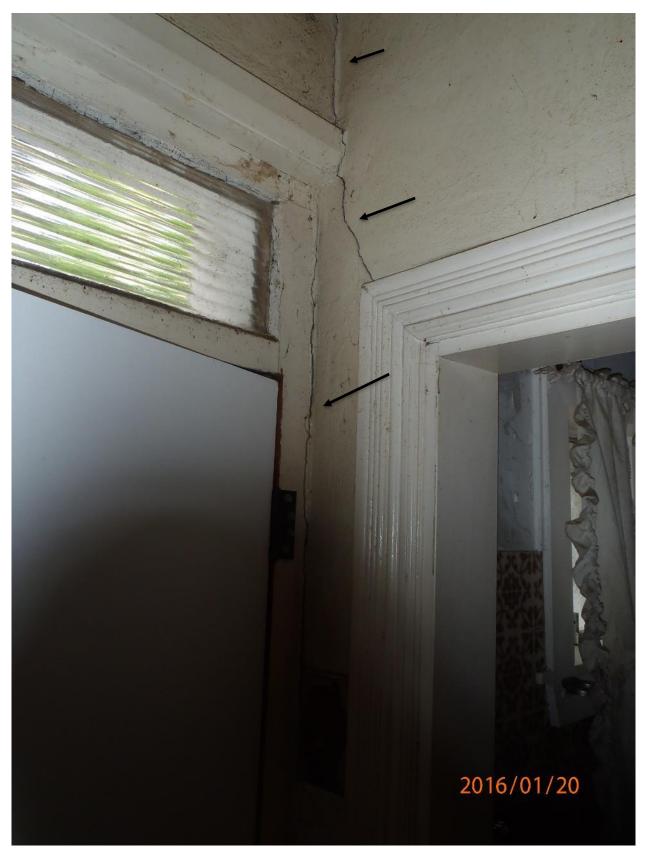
shows radial cracking to the cement rendered wall surfaces on the western wall extending from the door head toward the ceiling in the Study / Store.
